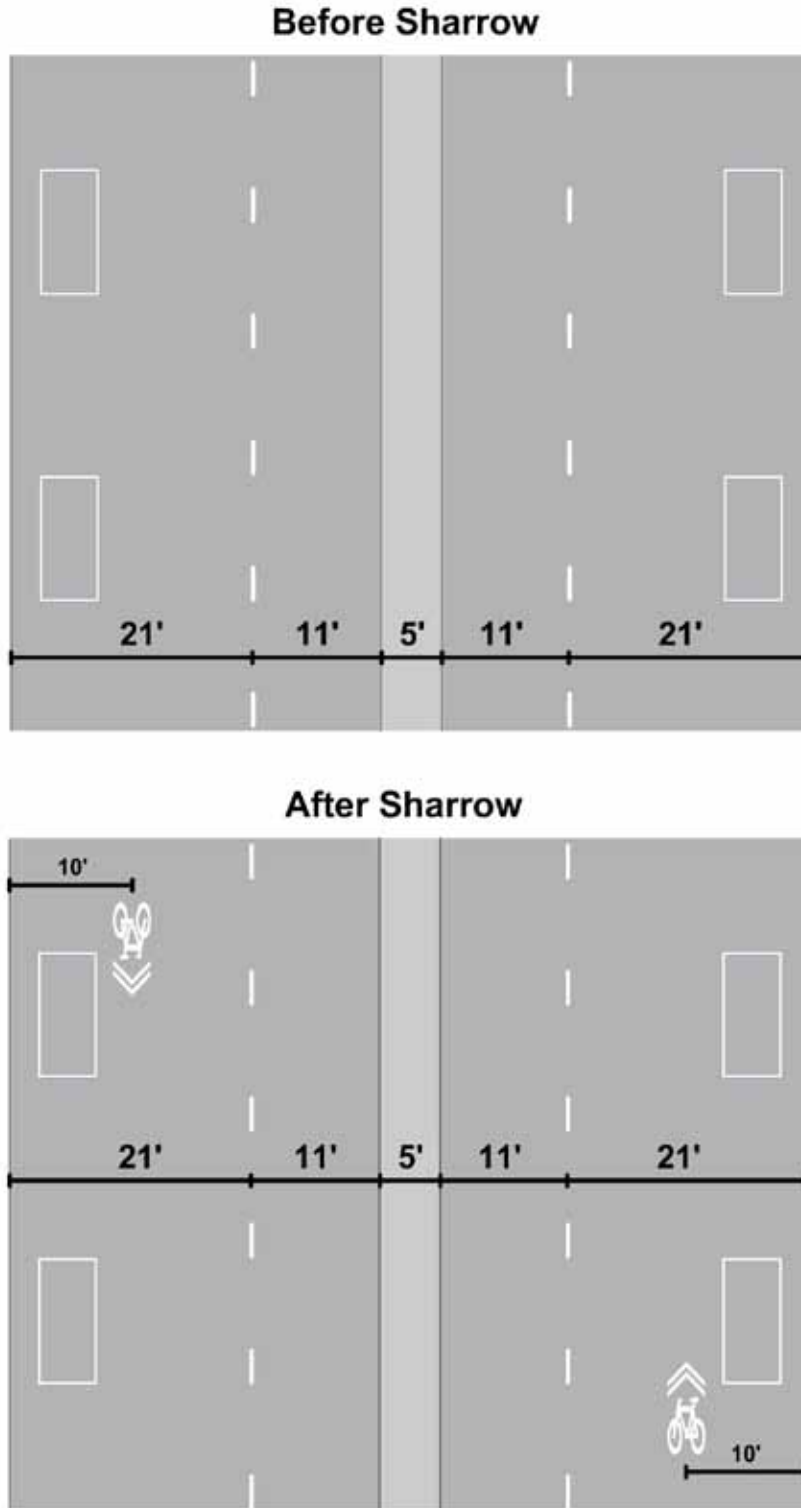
Illustration. Cross section view of Massachusetts Avenue before and after sharrow installation.
